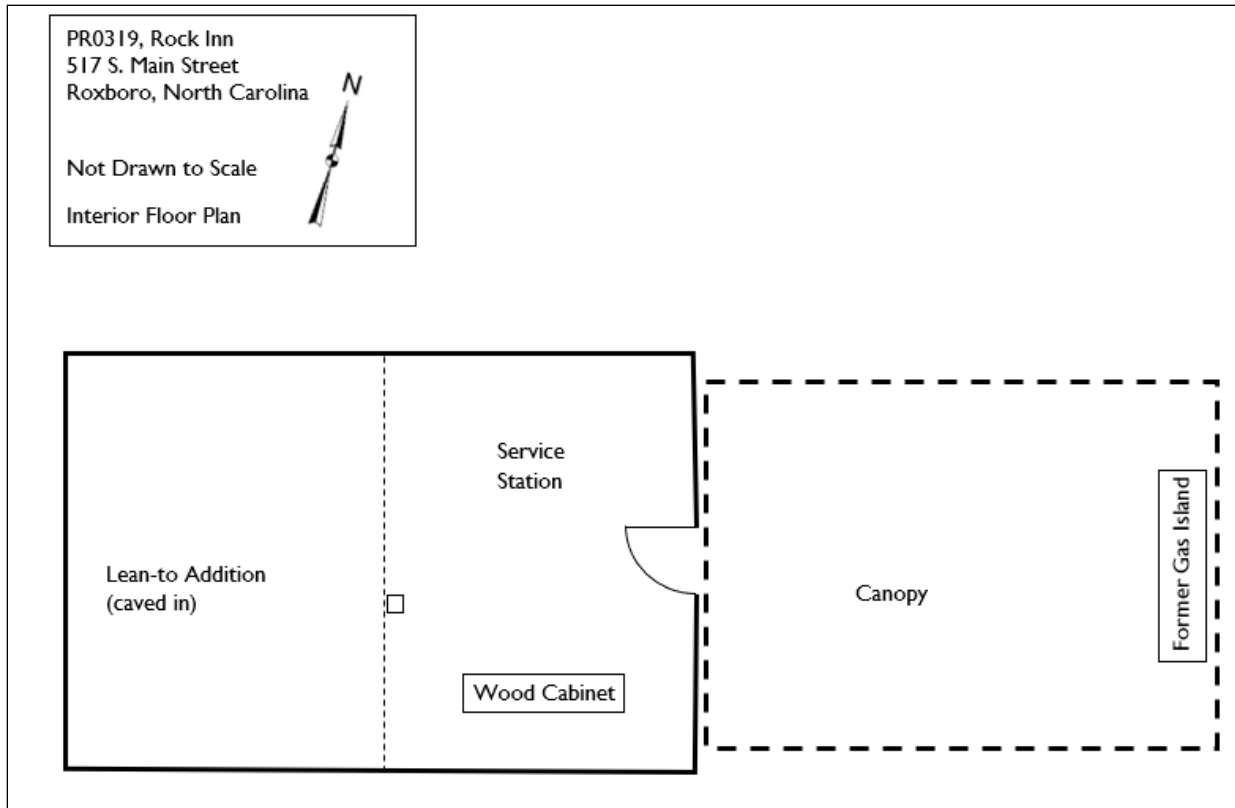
Rock Inn (PR0319) Interior Floor Plan.
